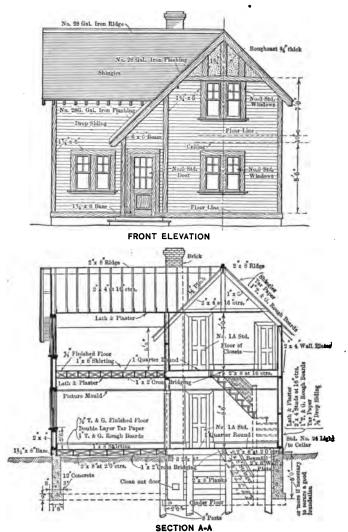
(Continued). C. P. R. No. 4 Standard Section House.
